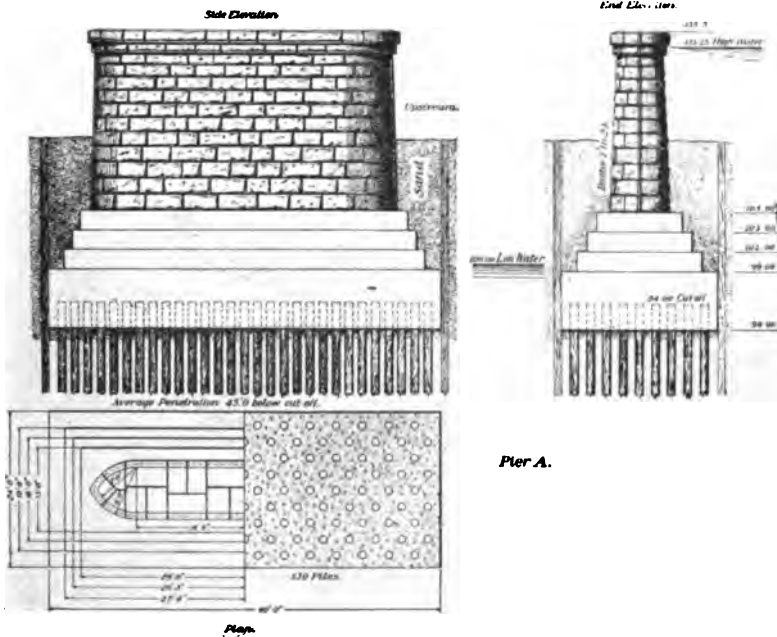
PIER A, VANCOUVER BRIDGE.
